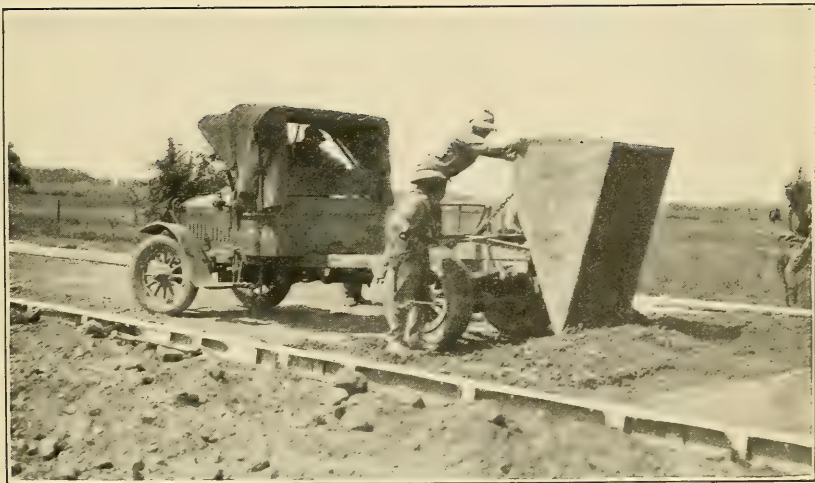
DUMPING MIXED CONCRETE ON THE ROAD.
